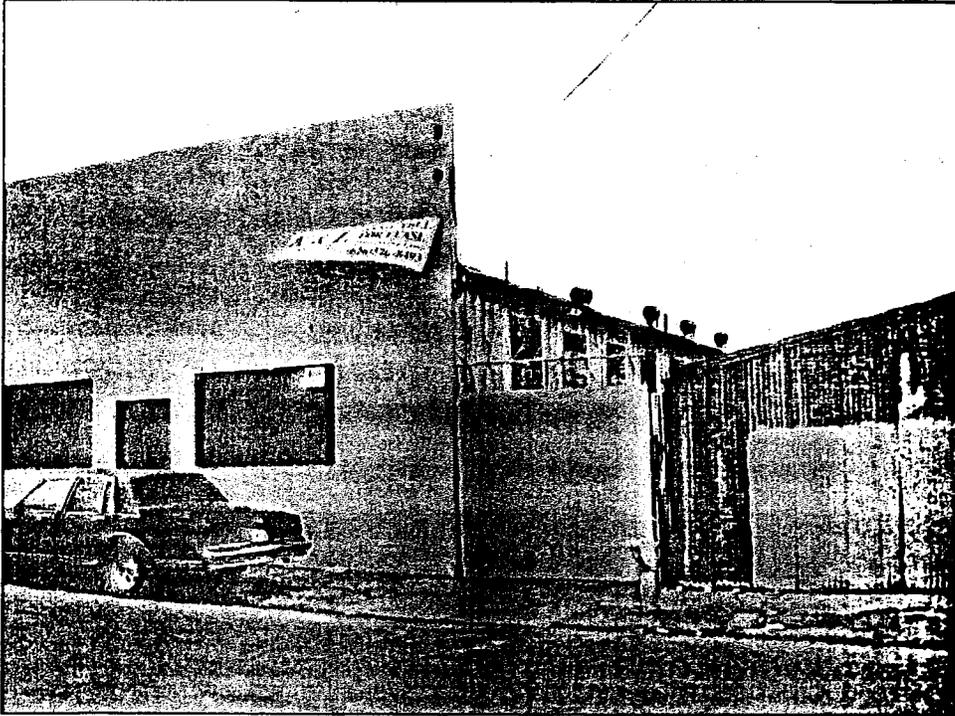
Deteriorated sidewalk at 4200 Whiteside St.
